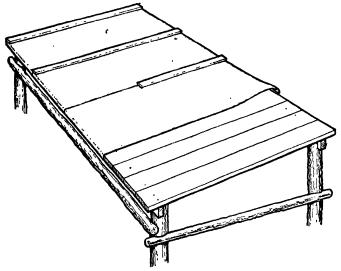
How Felt is Laid on Roof of Summer-House.
